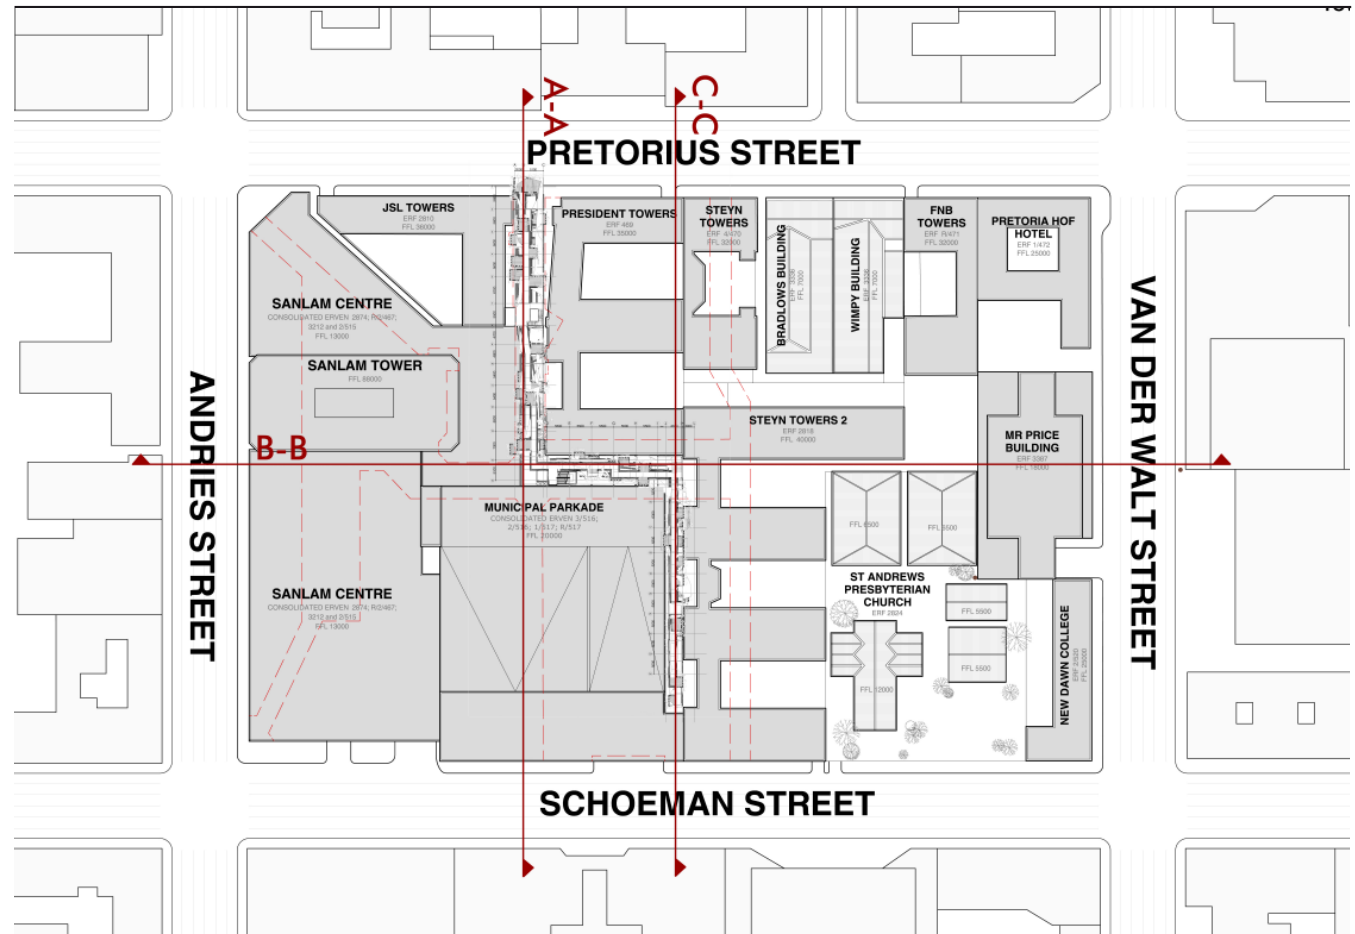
New site plan with the place of remembrance in the "between" (Author, 2011).
